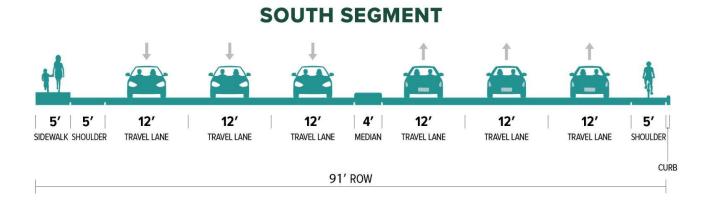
South Segment: Howe Avenue - La Riviera Access Road to Power Inn Station
